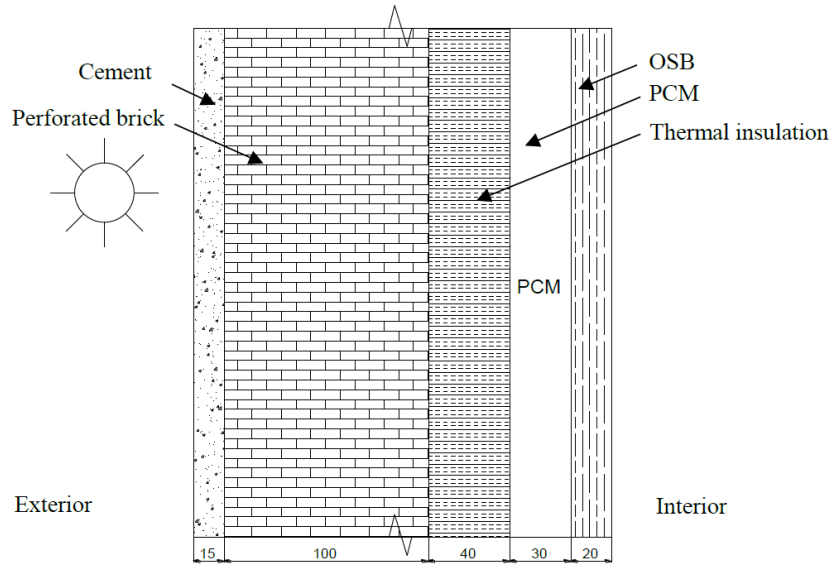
A schematic diagram showing the wall assemblies of a typical external wall (unit: mm).
